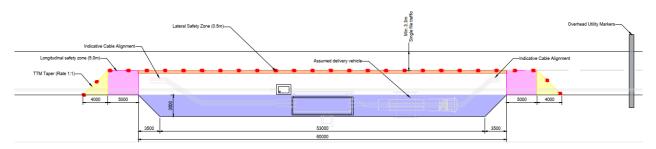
Indicative Traffic Management and Construction Platform Arrangement for a Joint Bay in the Road Verge
